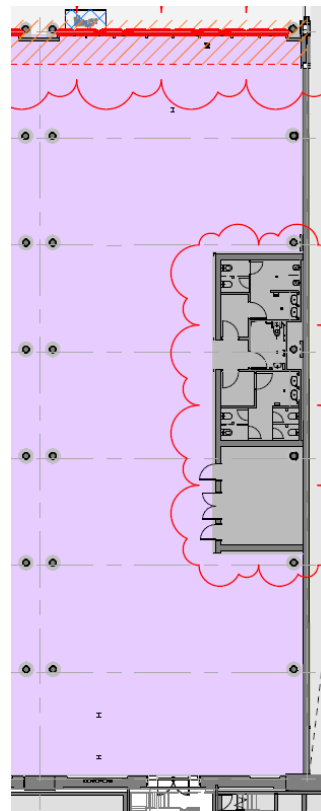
Proposed amenities and plant room pod (Source: Sissons, 2020)
